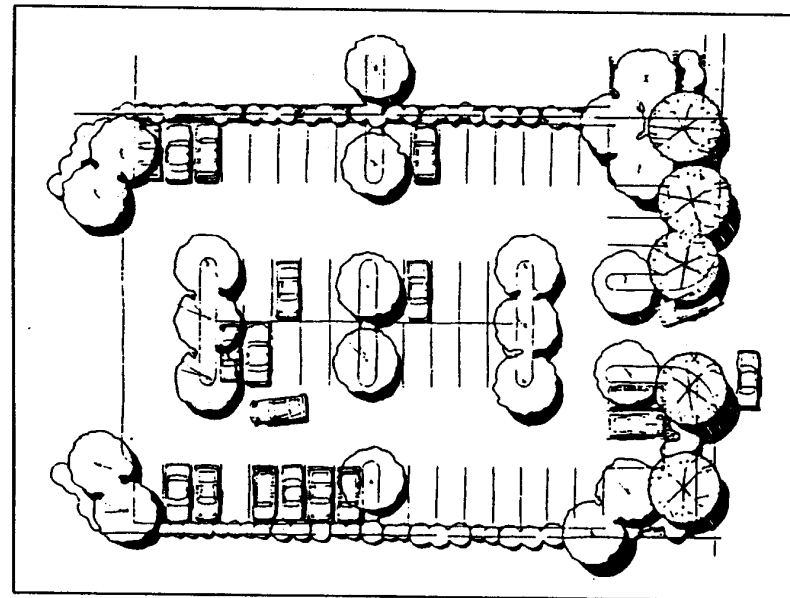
BUSINESS PARK PARKING LOT LANDSCAPE DESIGN CONCEPTS
